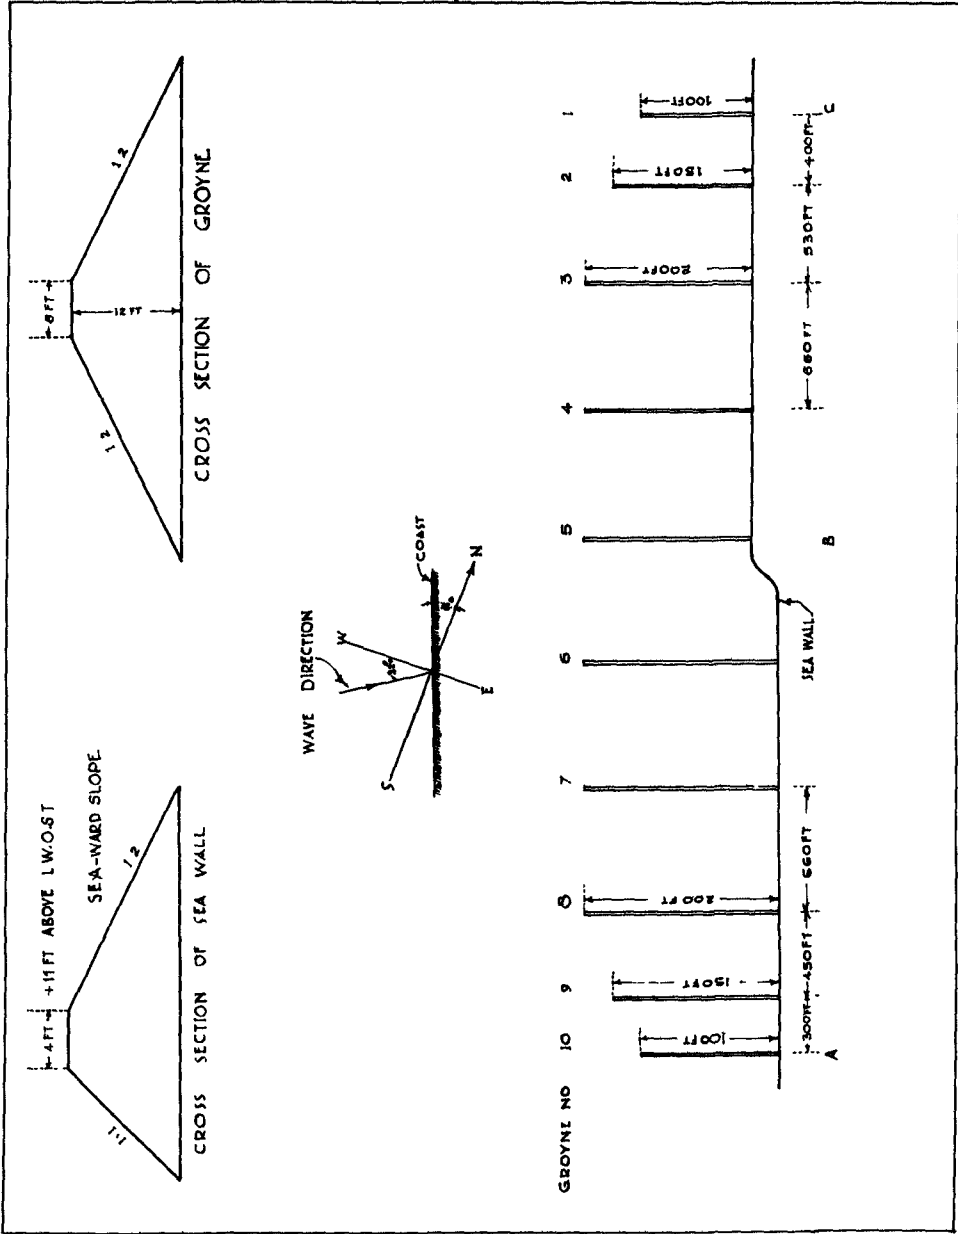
Plan of sea wall and groyne in a one mile experimental reach; portion AB is ma-
